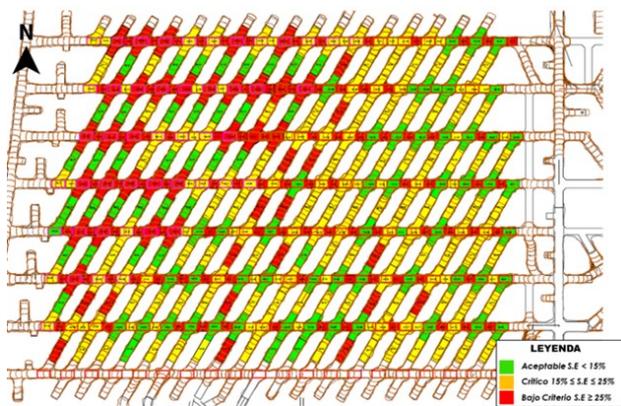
Plan View Pillar Over-Excavation, Macro block N1/S1, Chuquicamata Underground.
